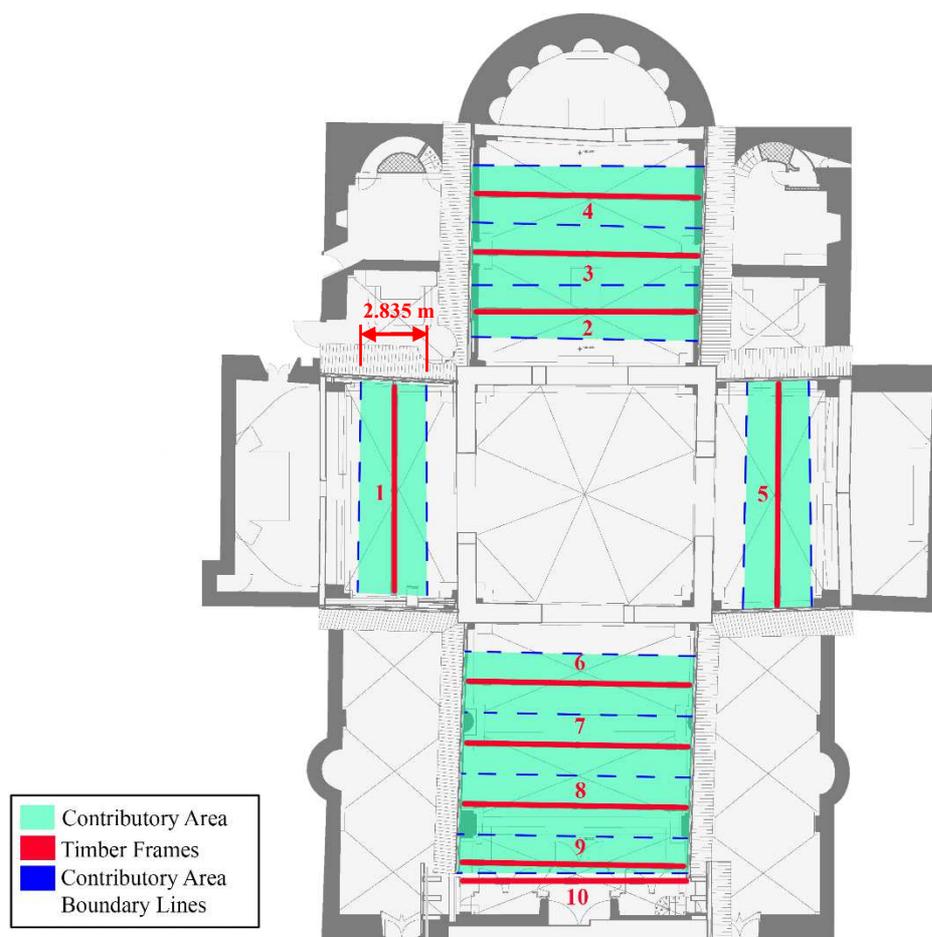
Plan View of Contributory Areas of Loading Strips Over Frames
